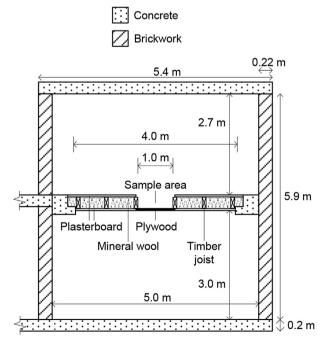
Section diagram of the vertical transmission suite (not to scale).
